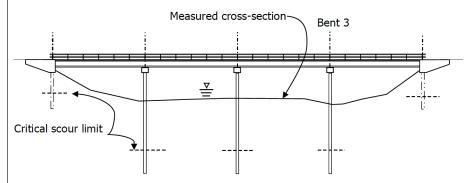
Elevation view showing scour elevations and stream cross-section for a bridge.
